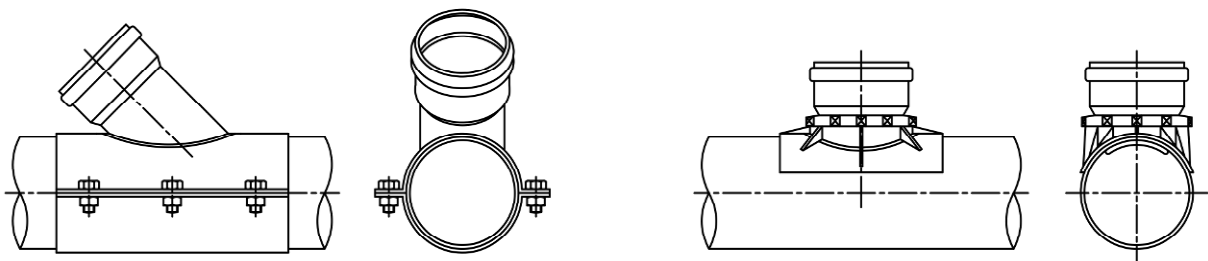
Examples of mechanical saddles connected to an existing installed pipe
